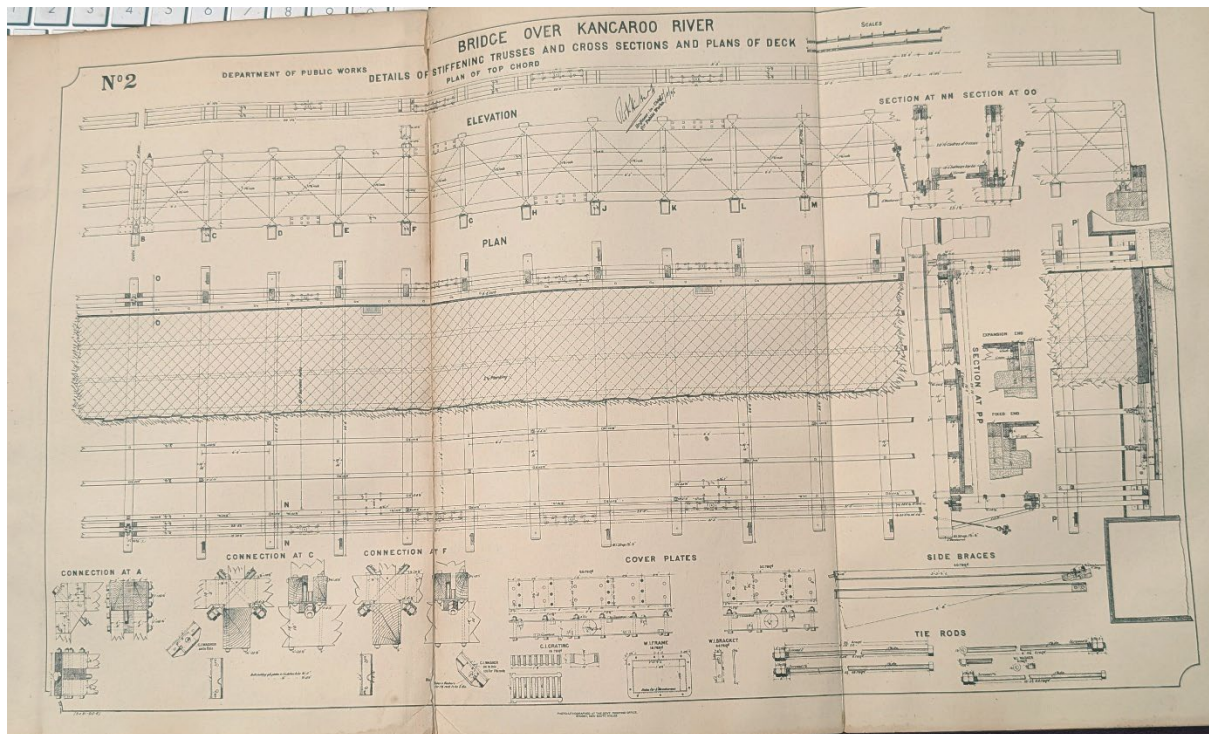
Details of Stiffening Trusses and Cross Sections and Plans of Deck, 1895 (Mitchell Library, Q624.23/1 – Sheet No. 2) Pratt truss 4.27 m deep, Oregon pine chords, steel diagonals, 18 ft roadway + 2 × 1.2 m footways.
